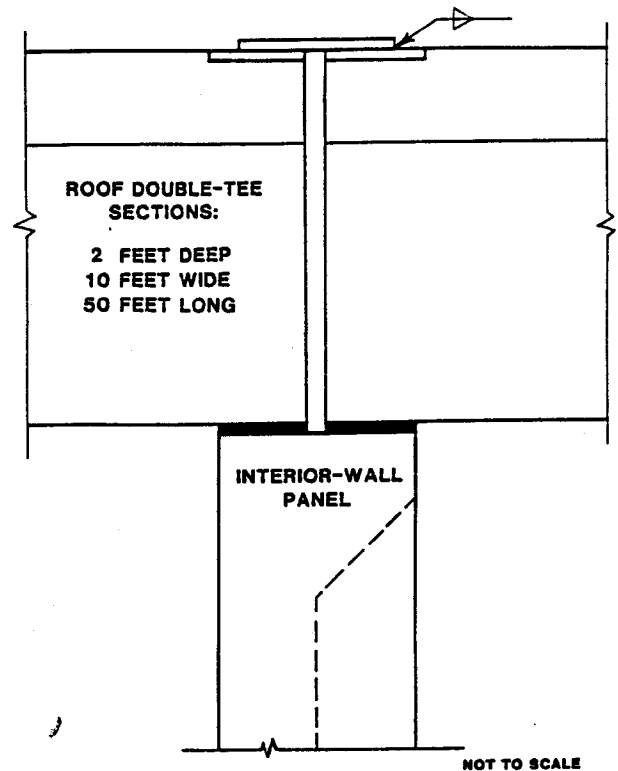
Detail section showing the bearing of roof double-tee sections upon the top of interior-wall panels.
